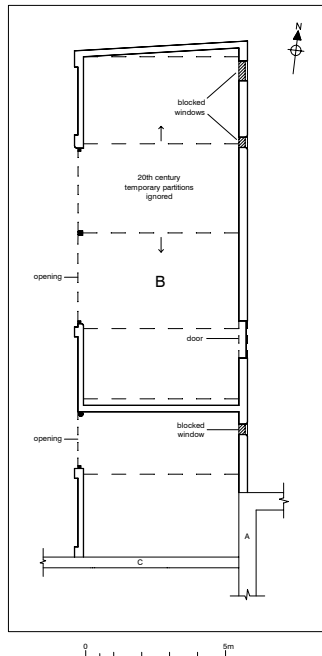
Plan of Stable 2 (Building B). Scale 1:100
